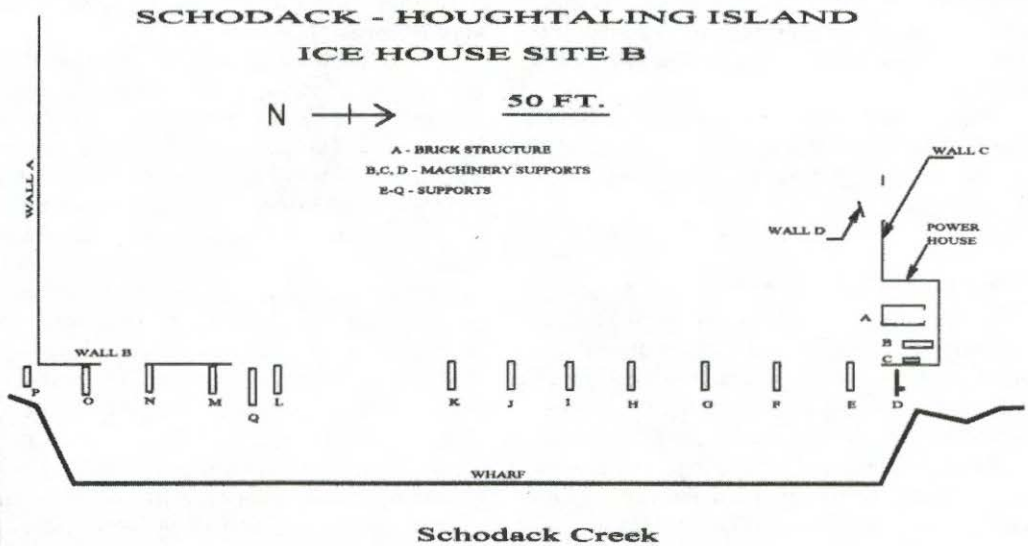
Ice House Site B (the P. McCabe & Co. Ice House). Plan of visible remains.
